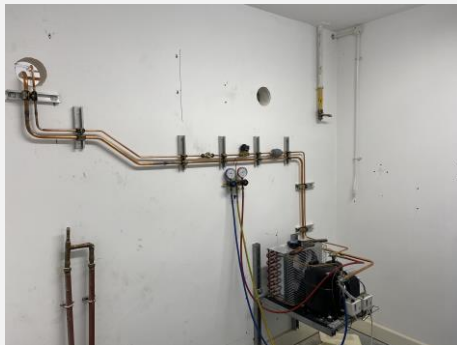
The offset conforming to the 150mm dimension. – demonstrates that the candidate can bend pipe accurately to a tolerance +/- 5mm.
